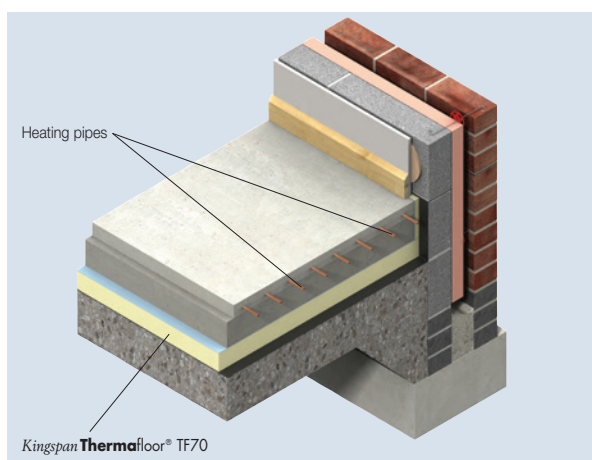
24 Hour Heating Applications – Below the Floor Slab
